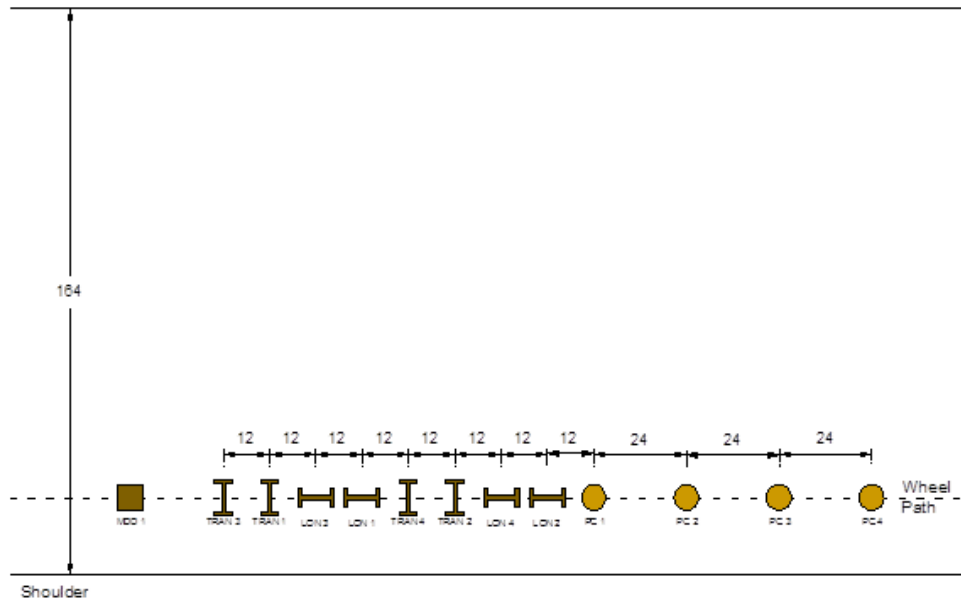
Illustration. Plan view of pavement structure and instrumentation for the 15%-RAP-AC test section at UC-Davis.
